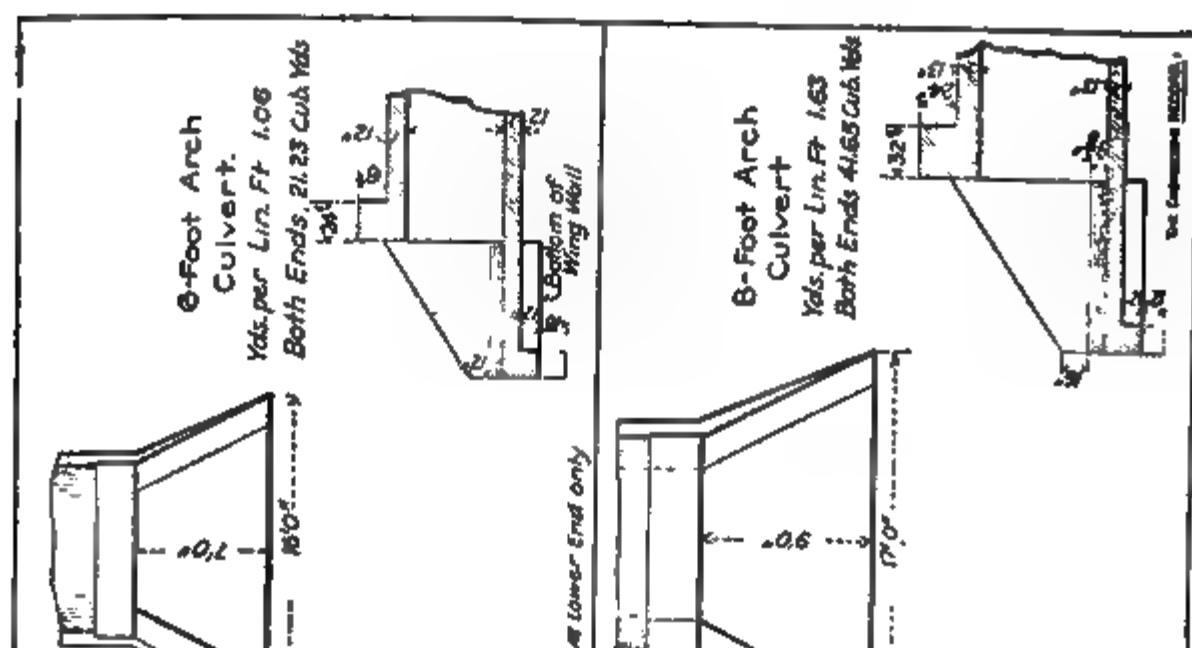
STANDARD MASONRY CULVERTS, MISSOURI PACIFIC RAILWAY.
